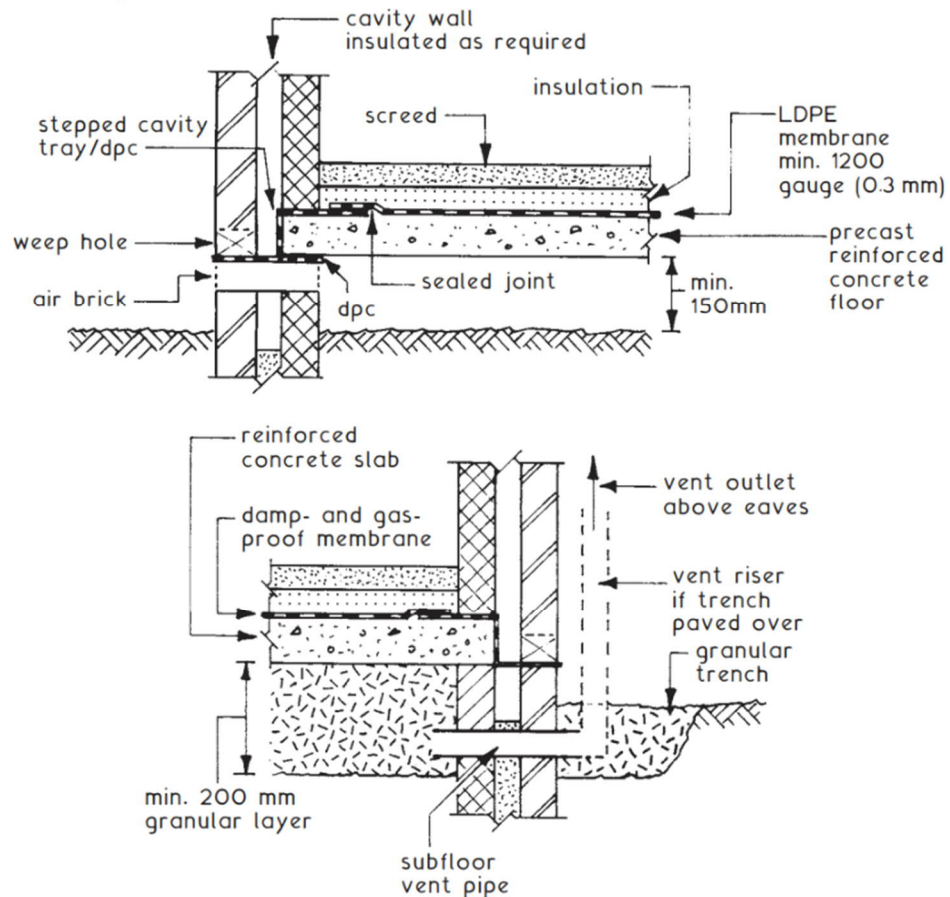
Suspended ground floor (top); ground floor with the ventilation path (bottom); (Chudley & Greeno, 2014, p. 416)
